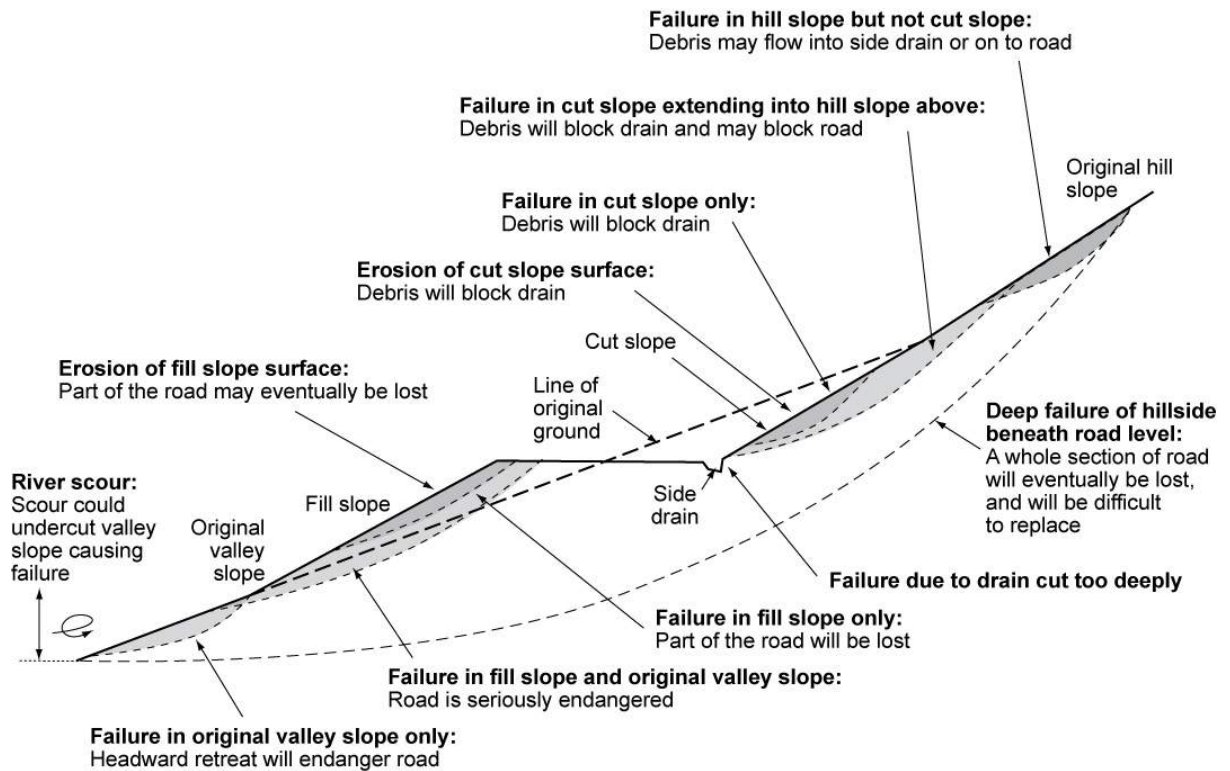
Slope instability affecting roads in hilly and mountainous terrain
